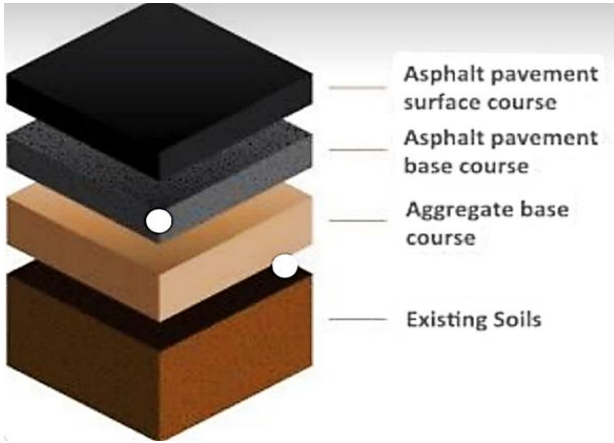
The representative vertical layout of an asphalt concrete pavement[10]
